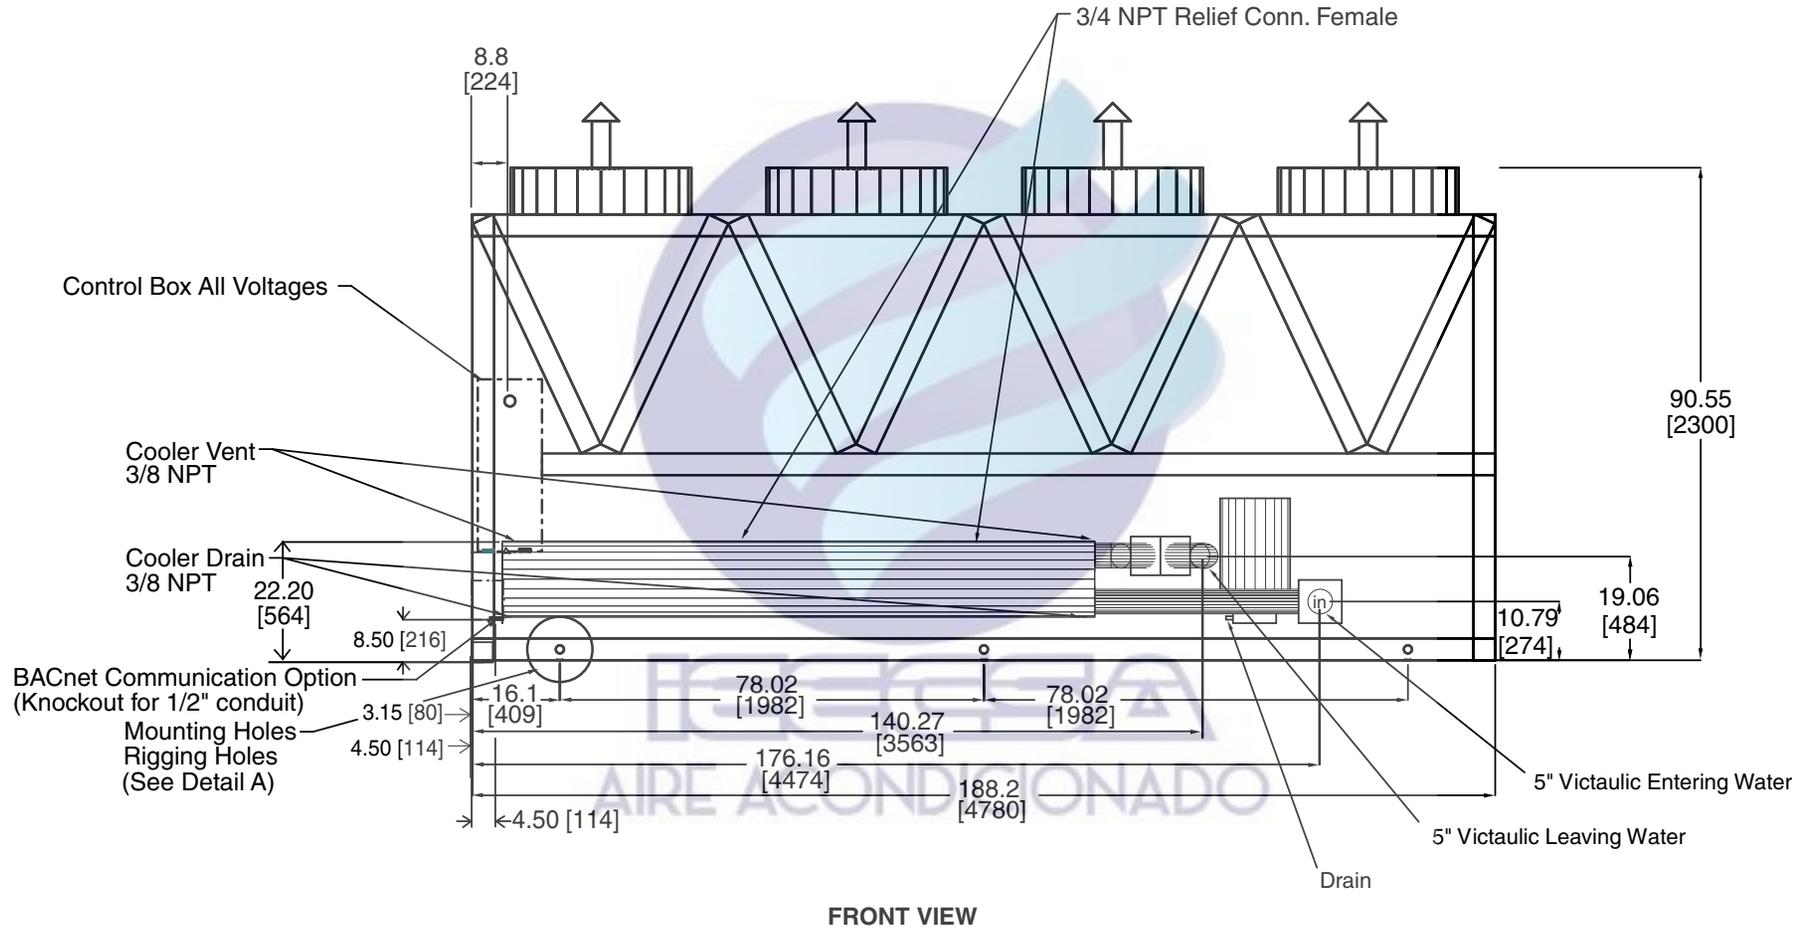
30XA090, 100, 110, 120 Air-Cooled Liquid Chiller Dimensions with Dual Pump (cont)
